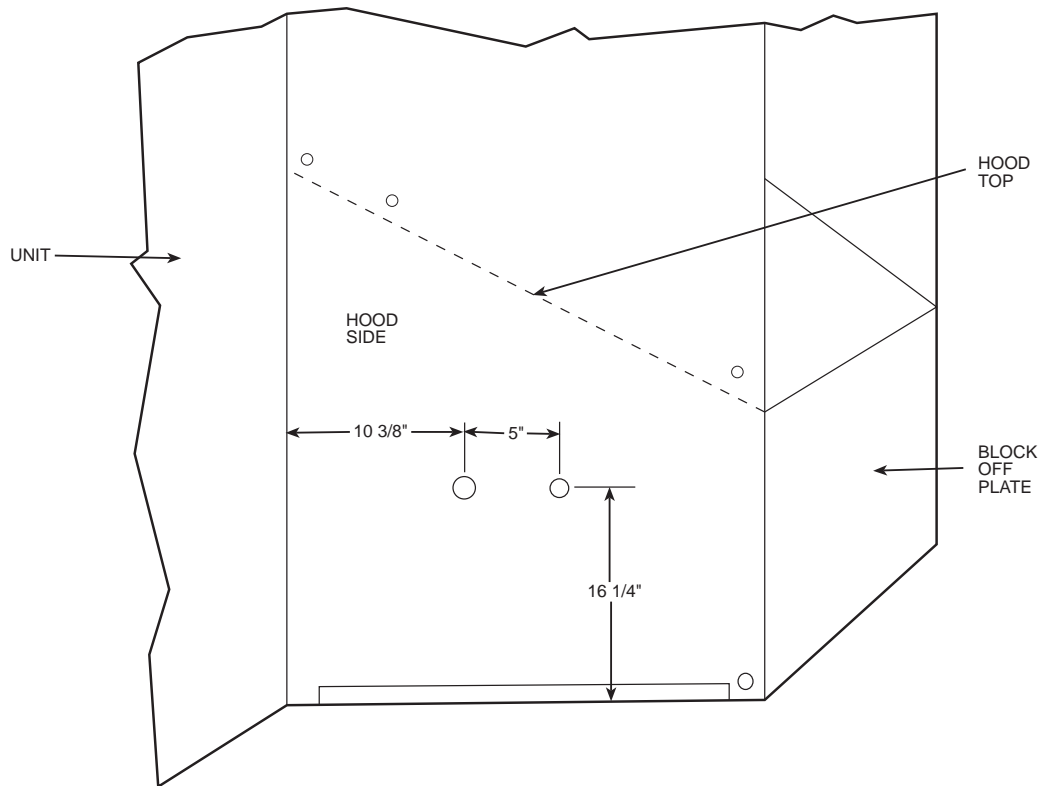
Mounting Brackets, 48/50MP Units
